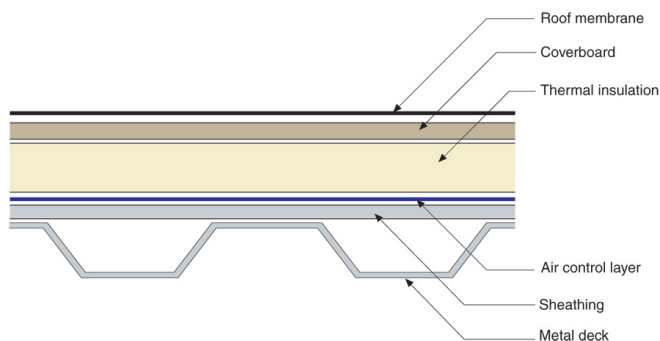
Perfect Compact Roof: The roof I would build if I was in charge. A continuous fully adhered air control layer supported by gypsum sheathing on the top of a metal deck. The gypsum sheathing is screwed to the metal deck. Rigid thermal insulation on the top of this air control layer—in two layers at least with the joints off-set horizontally and vertically. This insulation should be screwed down to the metal deck. Then on top of the rigid thermal insulation there should be a coverboard. This coverboard is also screwed down to the metal deck. Finally, a roof membrane is fully adhered to the coverboard.
